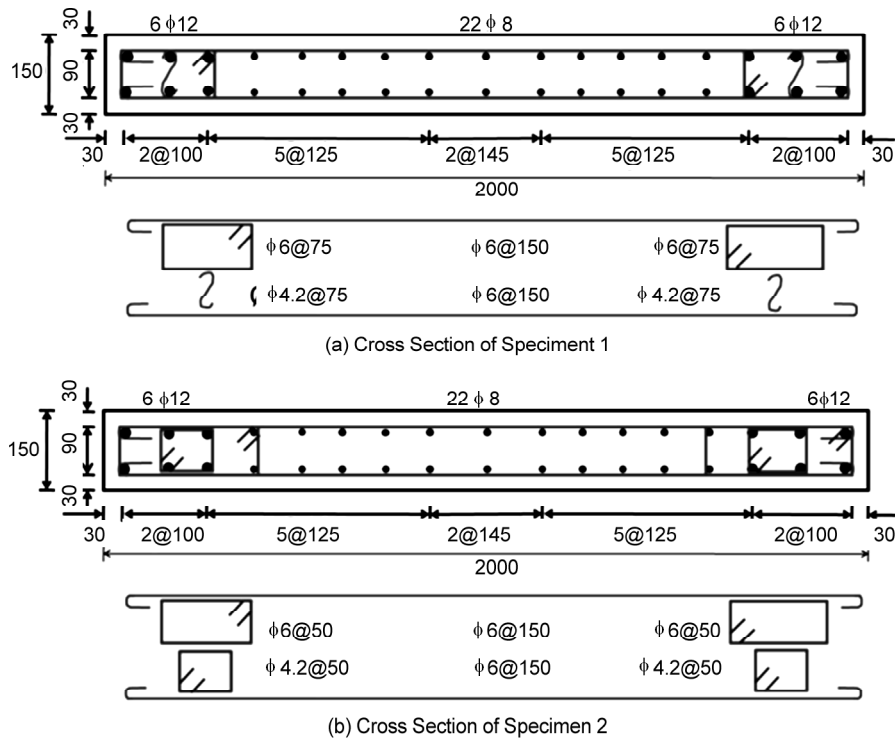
Reinforcement and section geometry of specimens (all dimensions in mm) [29].
